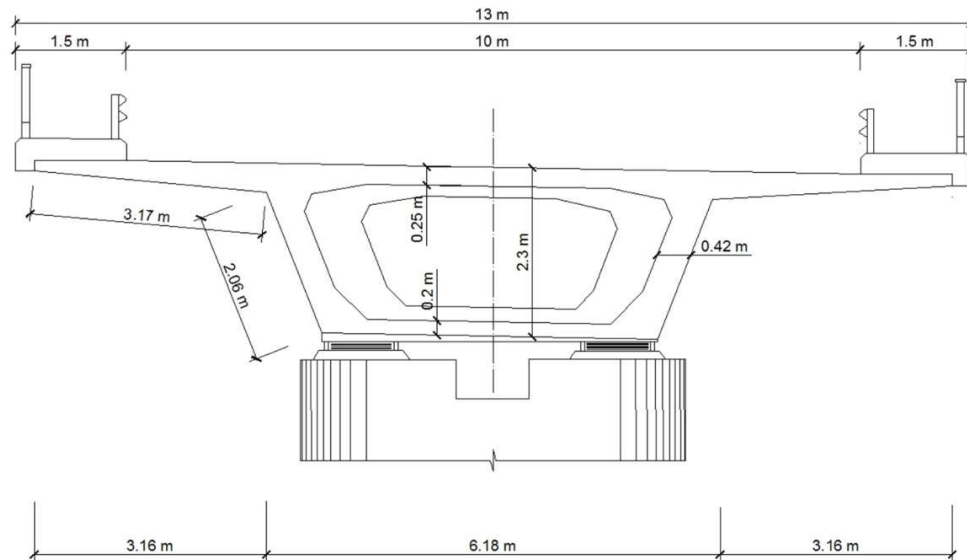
Cross section of the Arosa's concrete bridge deck
